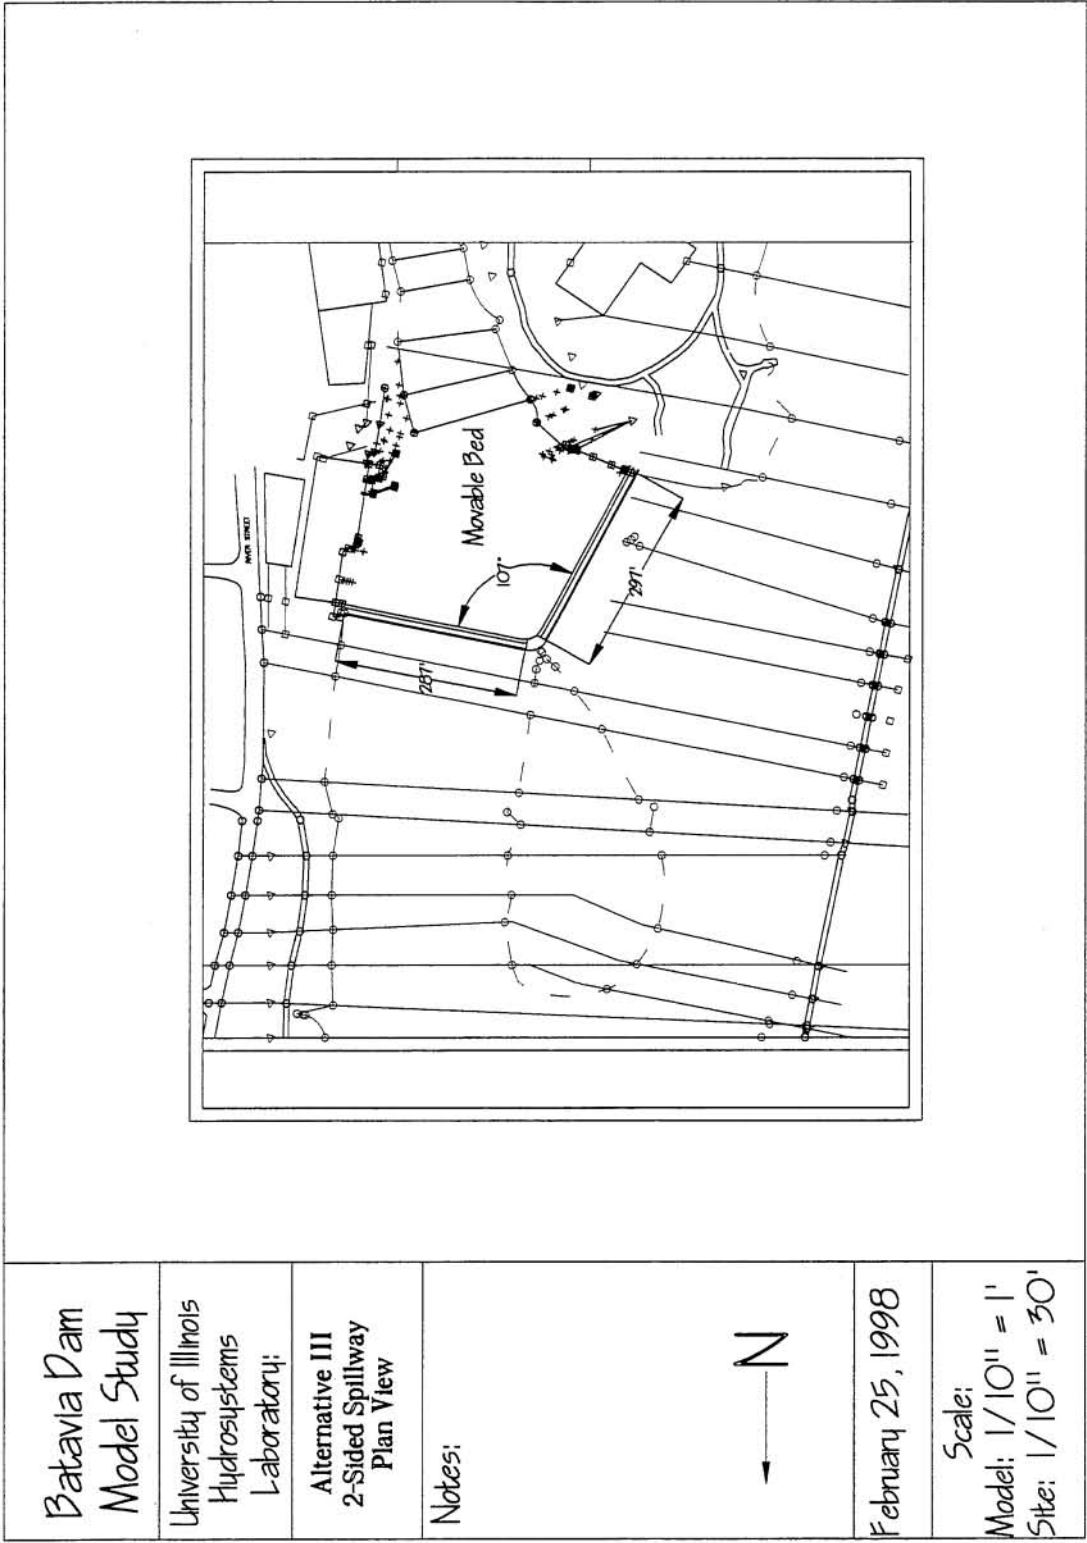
Schematic representation of 2-sided spillway - Plan view
